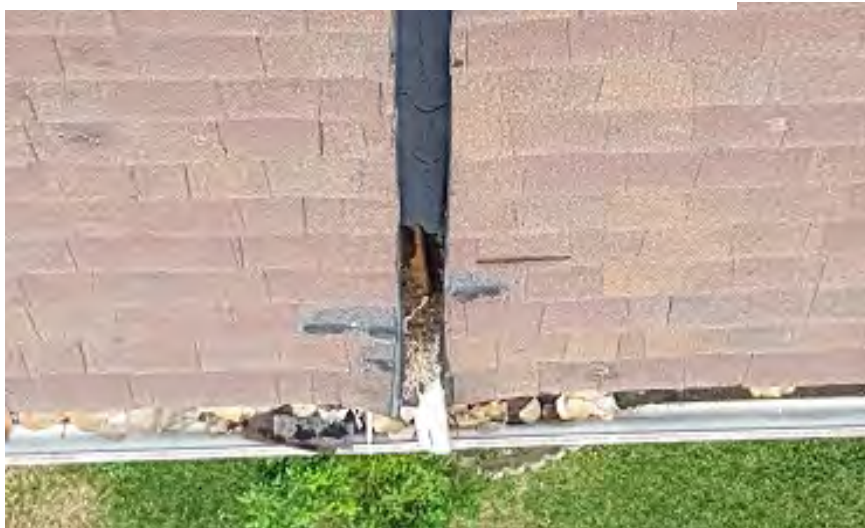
East Building Roof showing Deteriorated Vents, Penetrations, and Flashings (Looking South)
